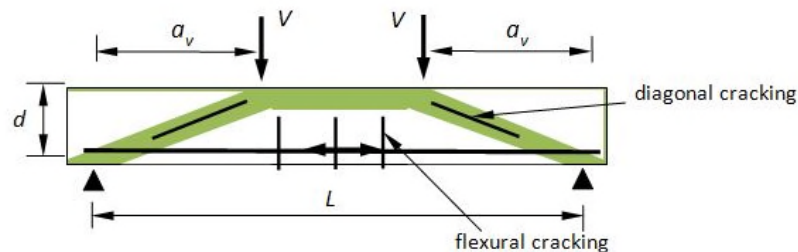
Proposed model for a simply-supported RC beam with longitudinal steel not bonded to concrete under two-point loading
